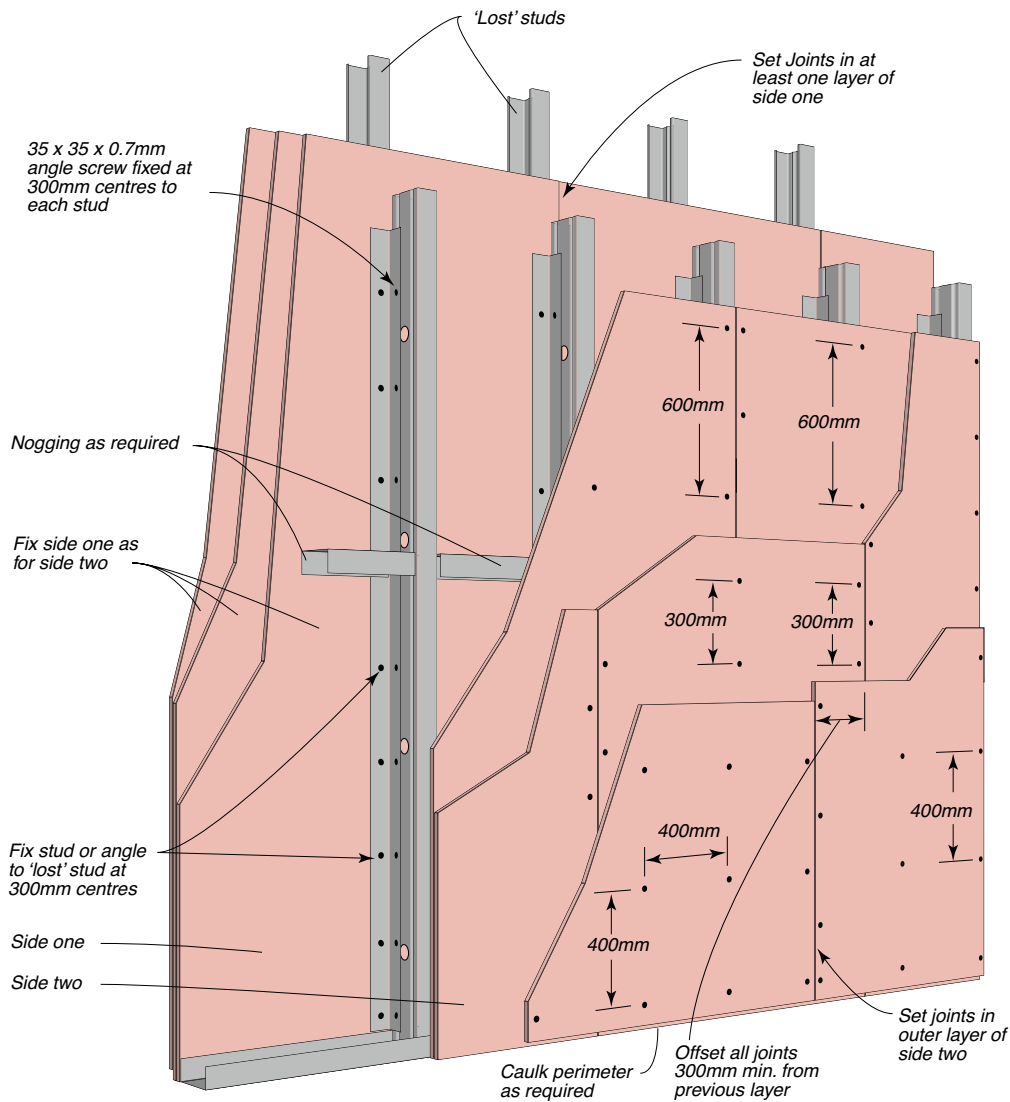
Alternative Installation Detail for Steel Frame Wall Systems – Two or Three Layer – Vertical or Horizontal Sheeting
